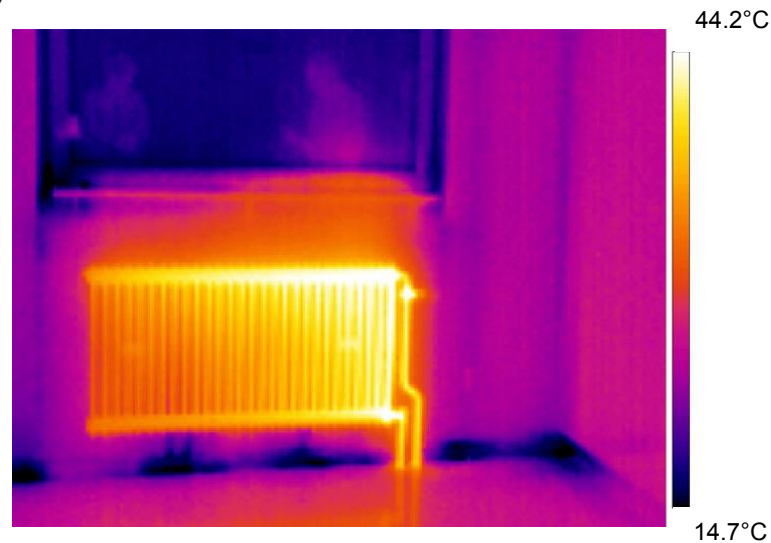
Right side of the bedroom in APT 1 towards outdoors.
